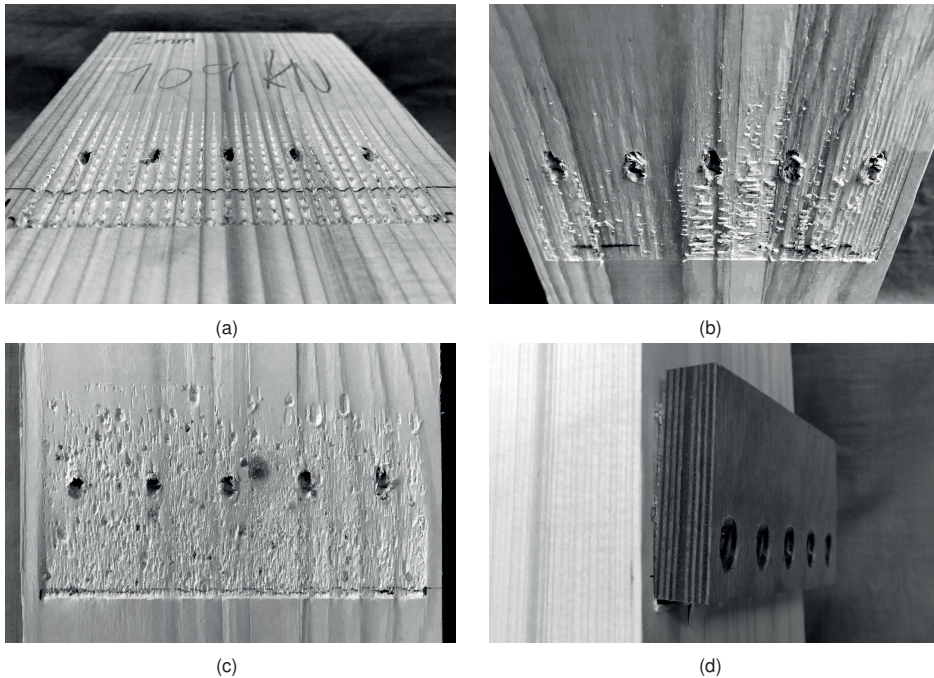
Softwood surface after tests: (a) pyramid pattern; (b) circular pattern; (c) coated with sand; (d) indentation of connector plate.
